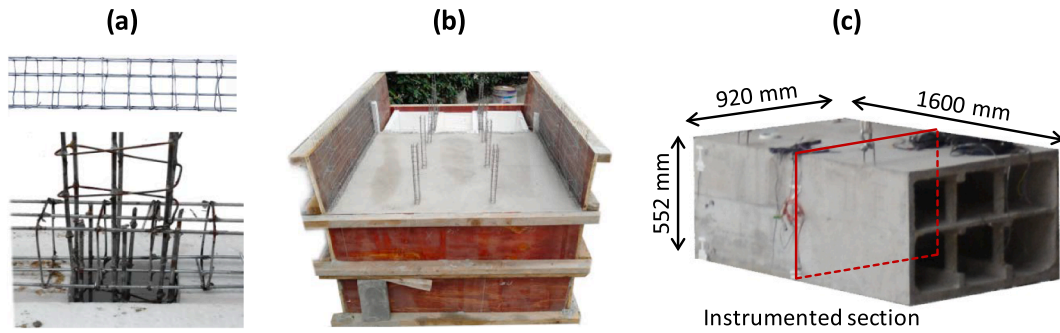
Construction of model structure: (a) preparation of reinforcement cage; (b) concrete casting in a formwork; and (c) final model structure after curing and removal of formwork.
